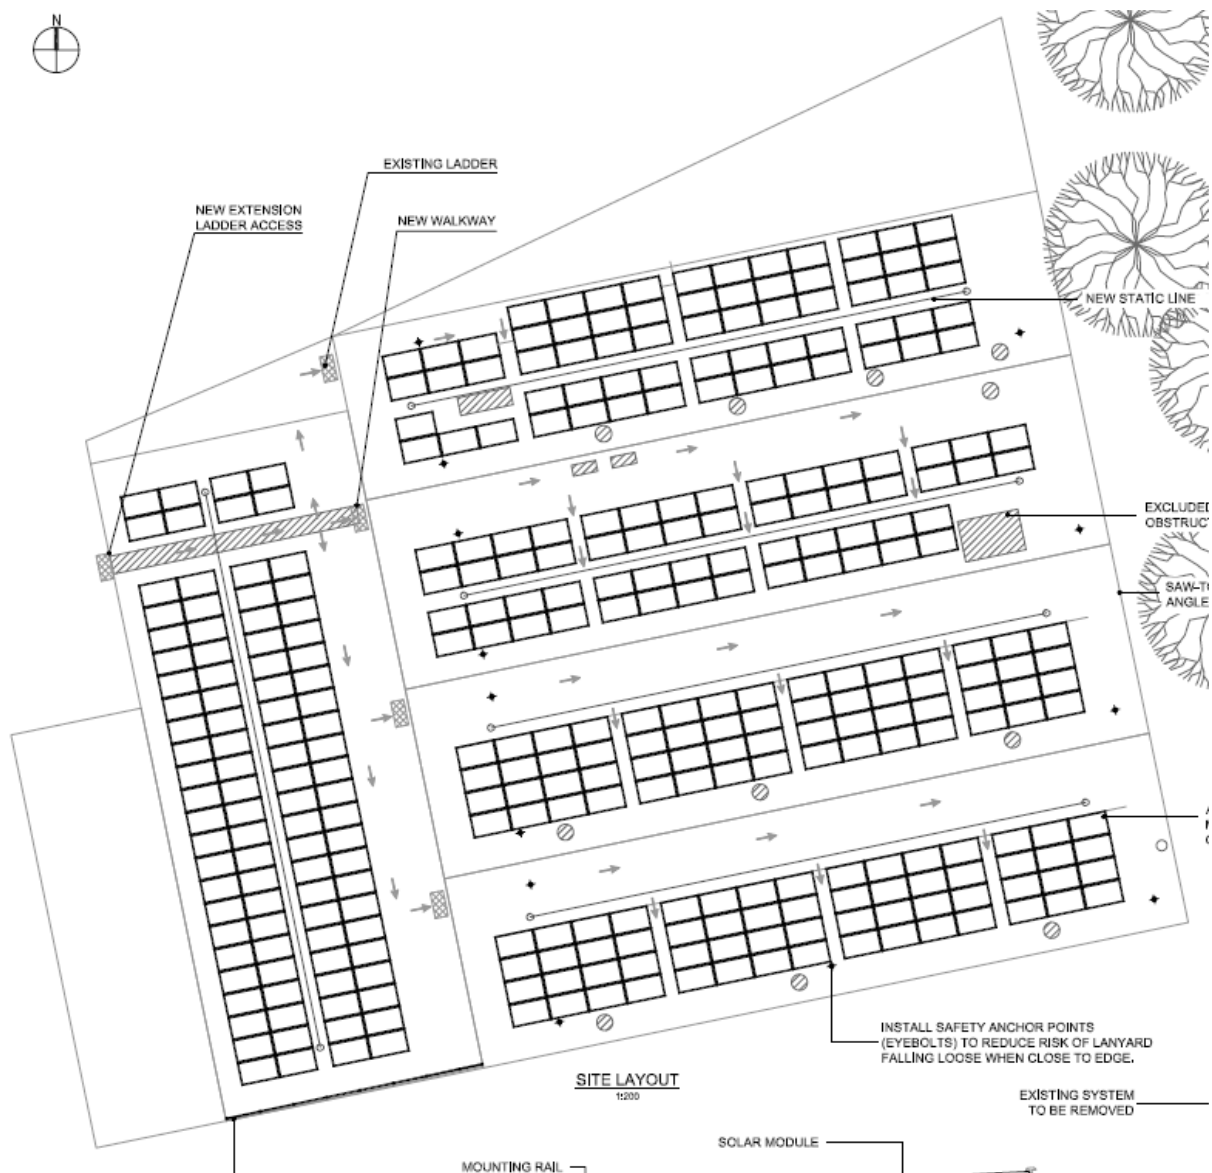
Roof plan of the site to illustrate the siting and number of solar panels proposed
